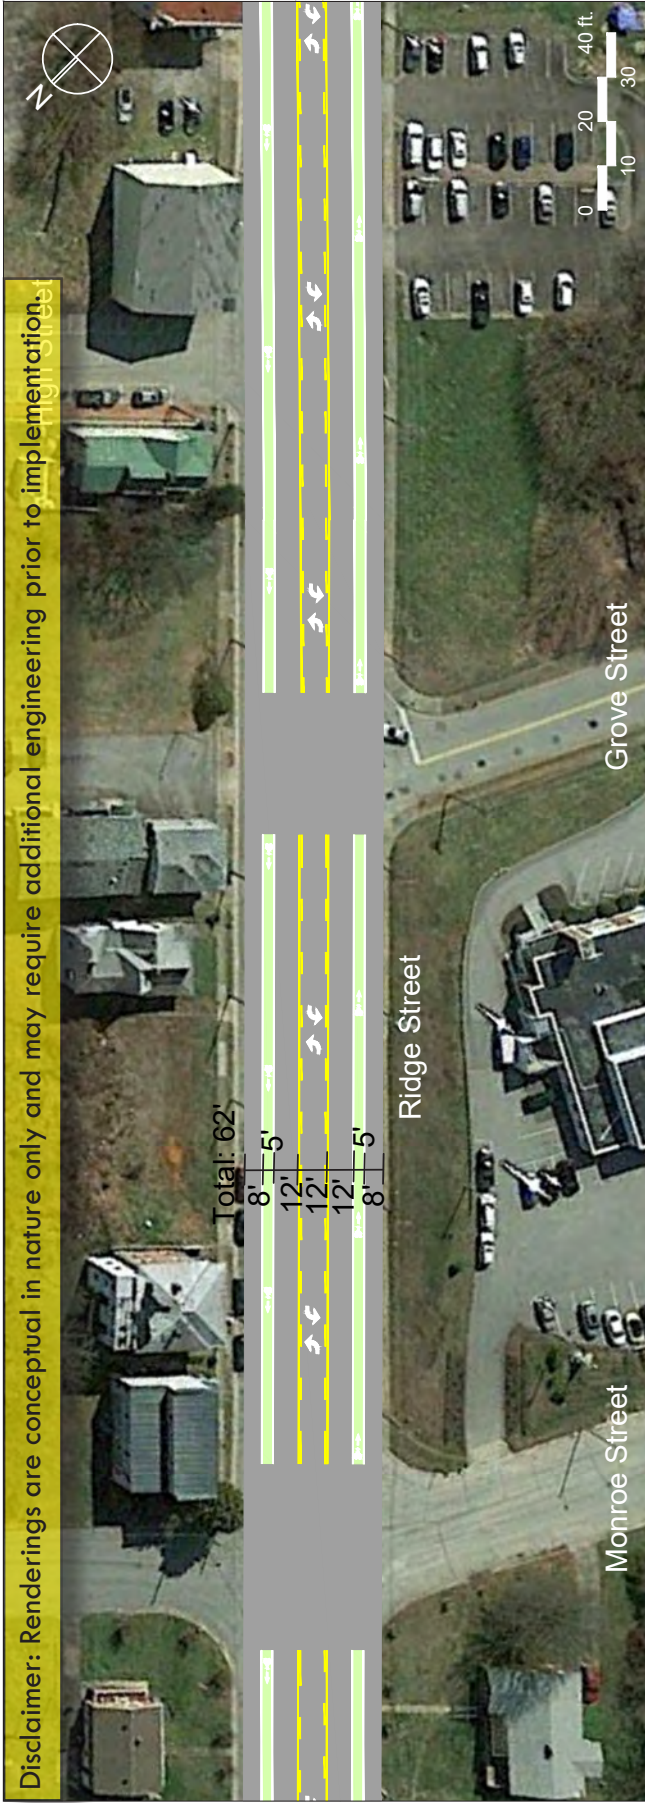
Ridge Street Road Diet Rendering (Page 1 of 4)
